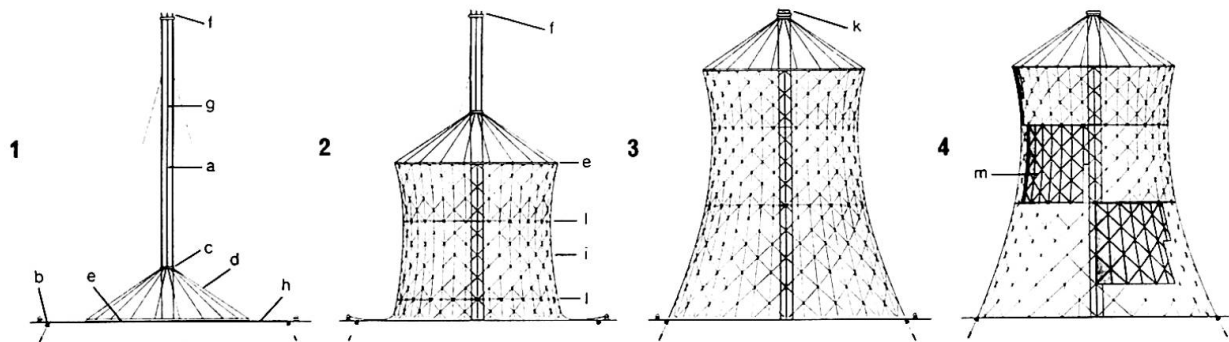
a Mast, b Foundation ring with soil anchors, c Hubring, d Spokes, e Compression ring, f Lifting device, g Lifting ropes, h Net ropes, i Cable-net mantle, k Prestressing device, l Spoke-wheels, m Cladding.
